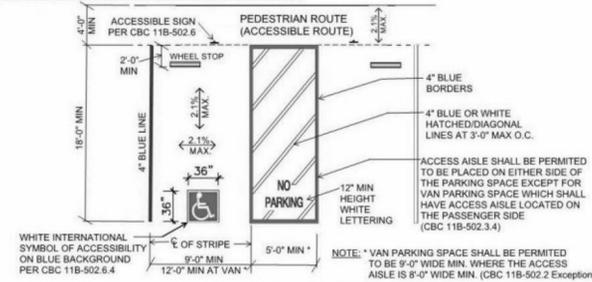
FIGURE: SINGLE ACCESSIBLE PARKING STALL
